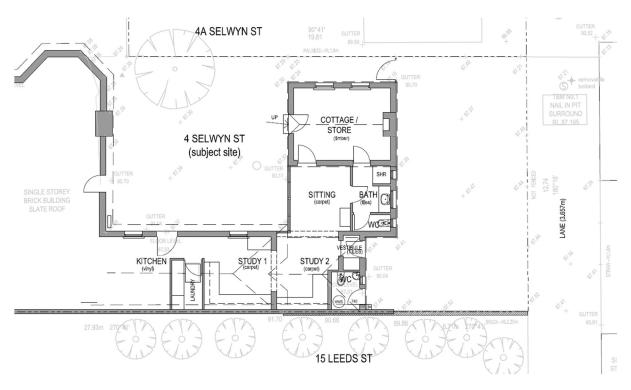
Existing Outbuildings Floor Plan, North is to the top of the page.
